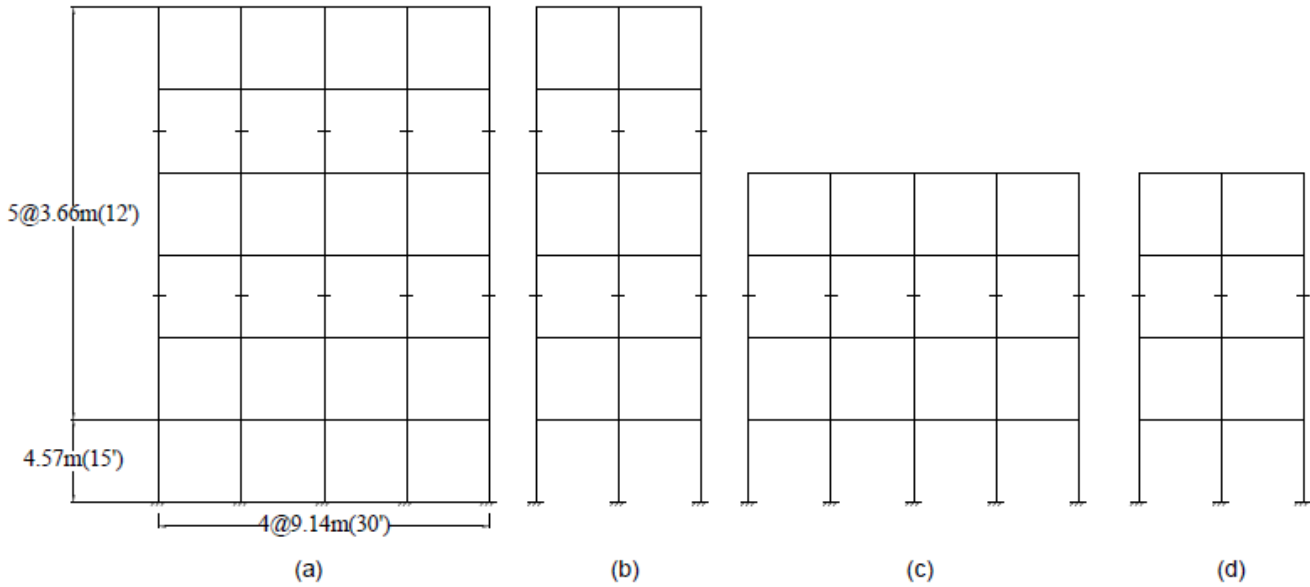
Elevation of the four building types of the mid-rise office building considered in the case study
